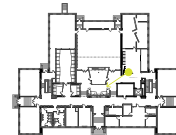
& 5.46: 2nd Floor Studio Facing into Parking Lot
